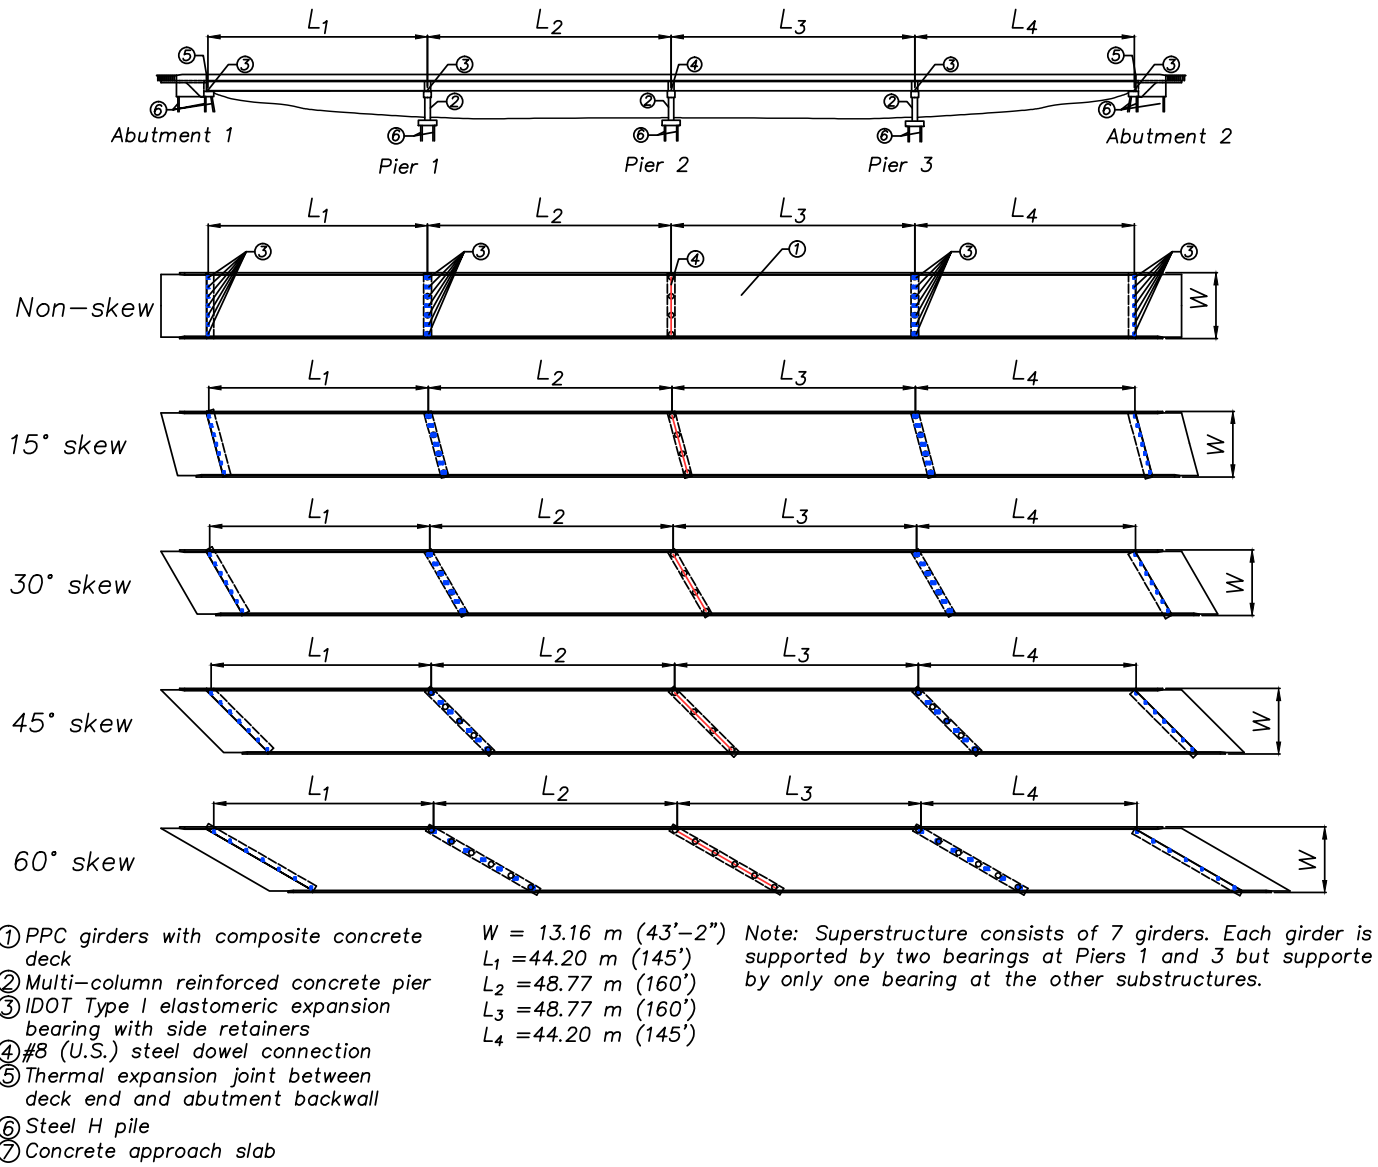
Prototype four-span prestressed-precast-concrete-girder (4C) quasi-isolated seat-type abutment bridges
